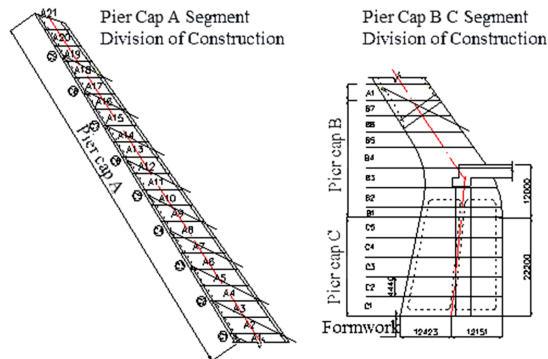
Diagram of segmented construction for cable-stayed towers (mm)
